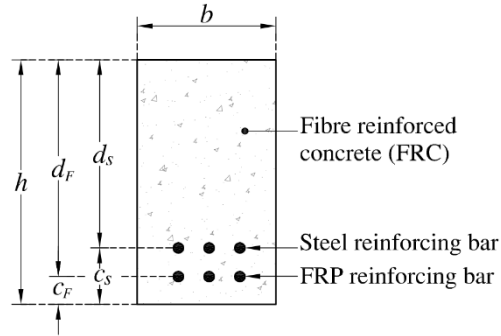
Geometry and reinforcing scheme of the cross-section
